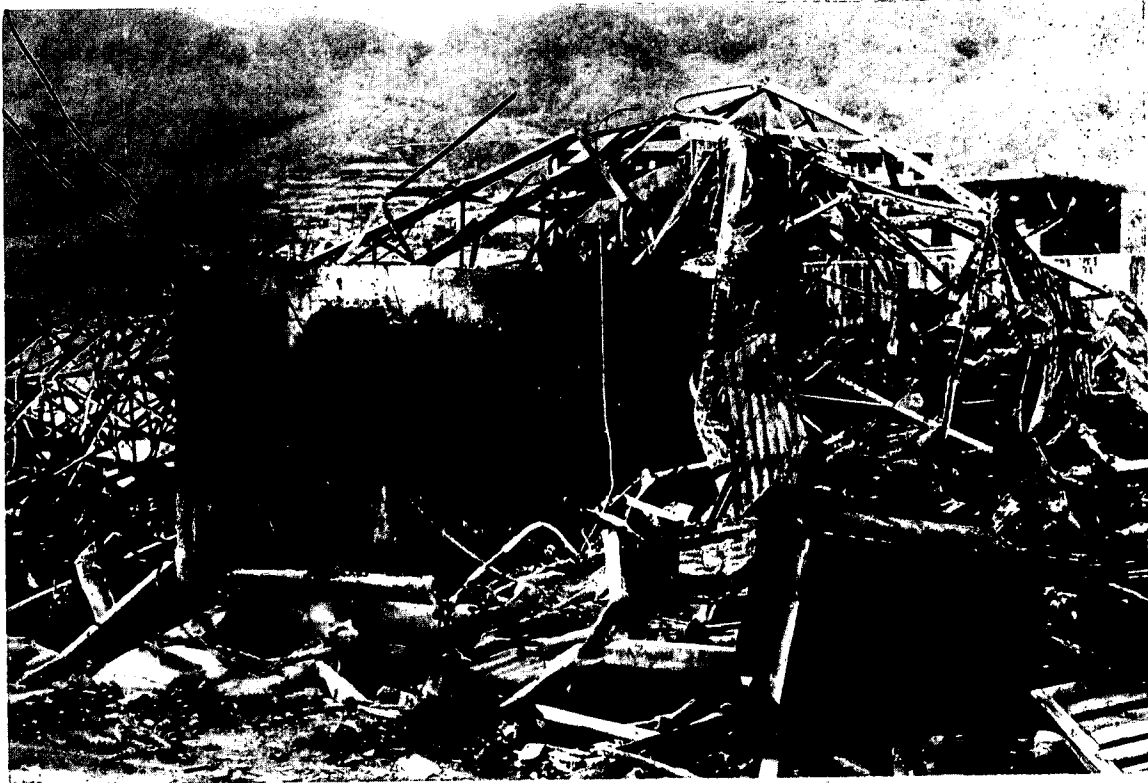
(5N)--Mitsubishi Arms Factory, 1100 meters. Type of damage that occurred to light concrete, steel-framed buildings. Notice the corrugated sheets from the roof, which caused serious wounds. (Photo File #NB 438.)
